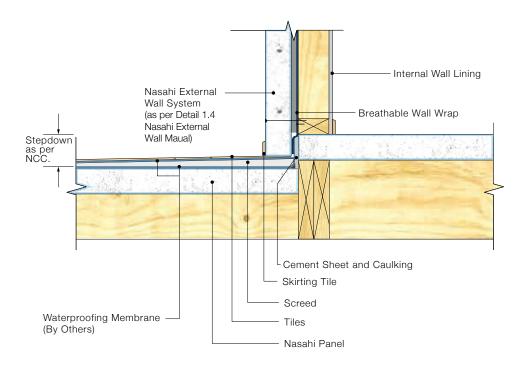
Shower Recess Panel Layout (75mm Panel)
